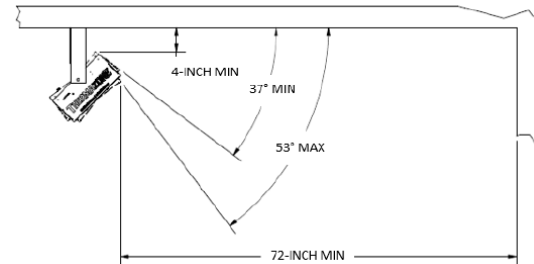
CEILING MOUNTING ANGLED TOWARDS VERTICAL SURFACE
